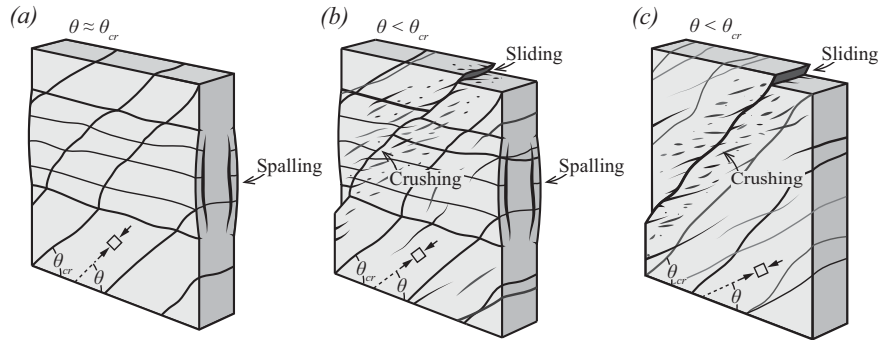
Potential failure mechanism of structural panels: (a) spalling of the concrete cover in case of small stress field rotation; (b) spalling and combined crushing with sliding failure in case of moderate stress field rotation and (c) crushing and sliding of the concrete struts in case of significant stress field rotations
